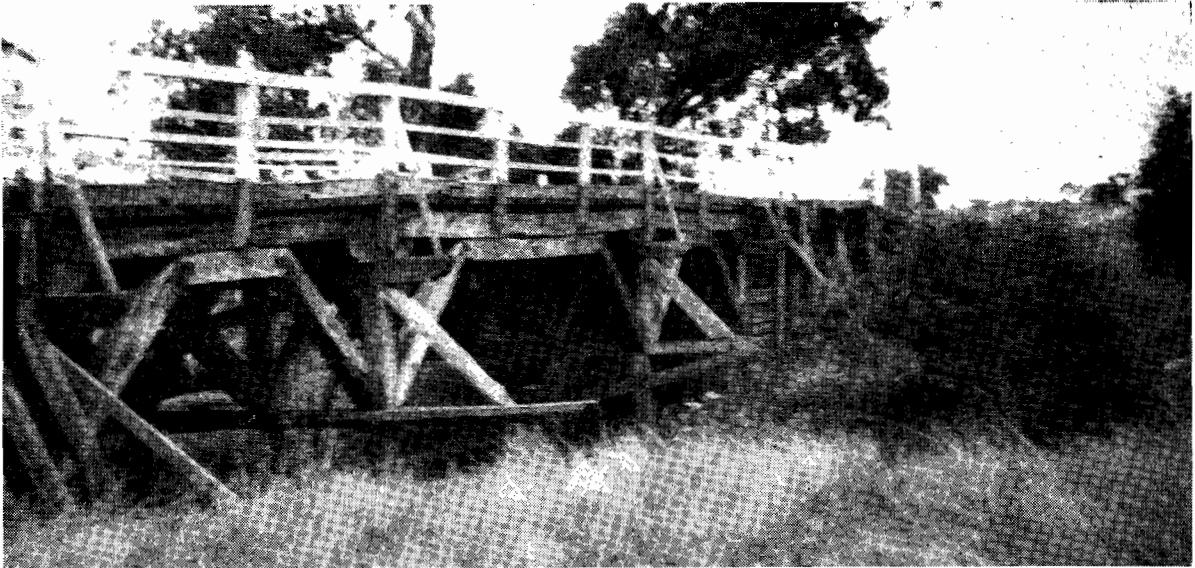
Calder Highway. Old bridge over Bullabul Creek west of Bridgewater.
